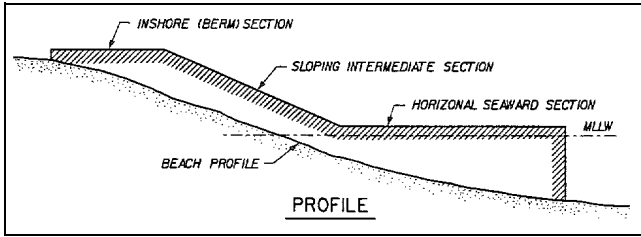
Typical groin profile showing inshore (berm) section, sloping intermediate section, and horizontal seaward section
